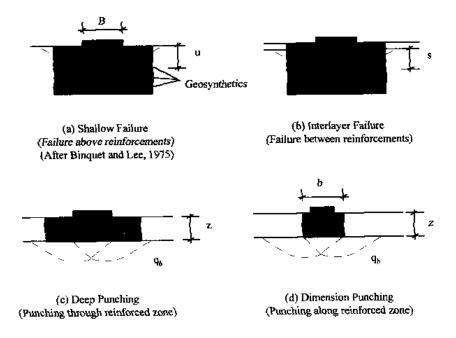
Possible Failure Modes in Geogrid-Reinforced Foundations [Wayne et al 1998]
